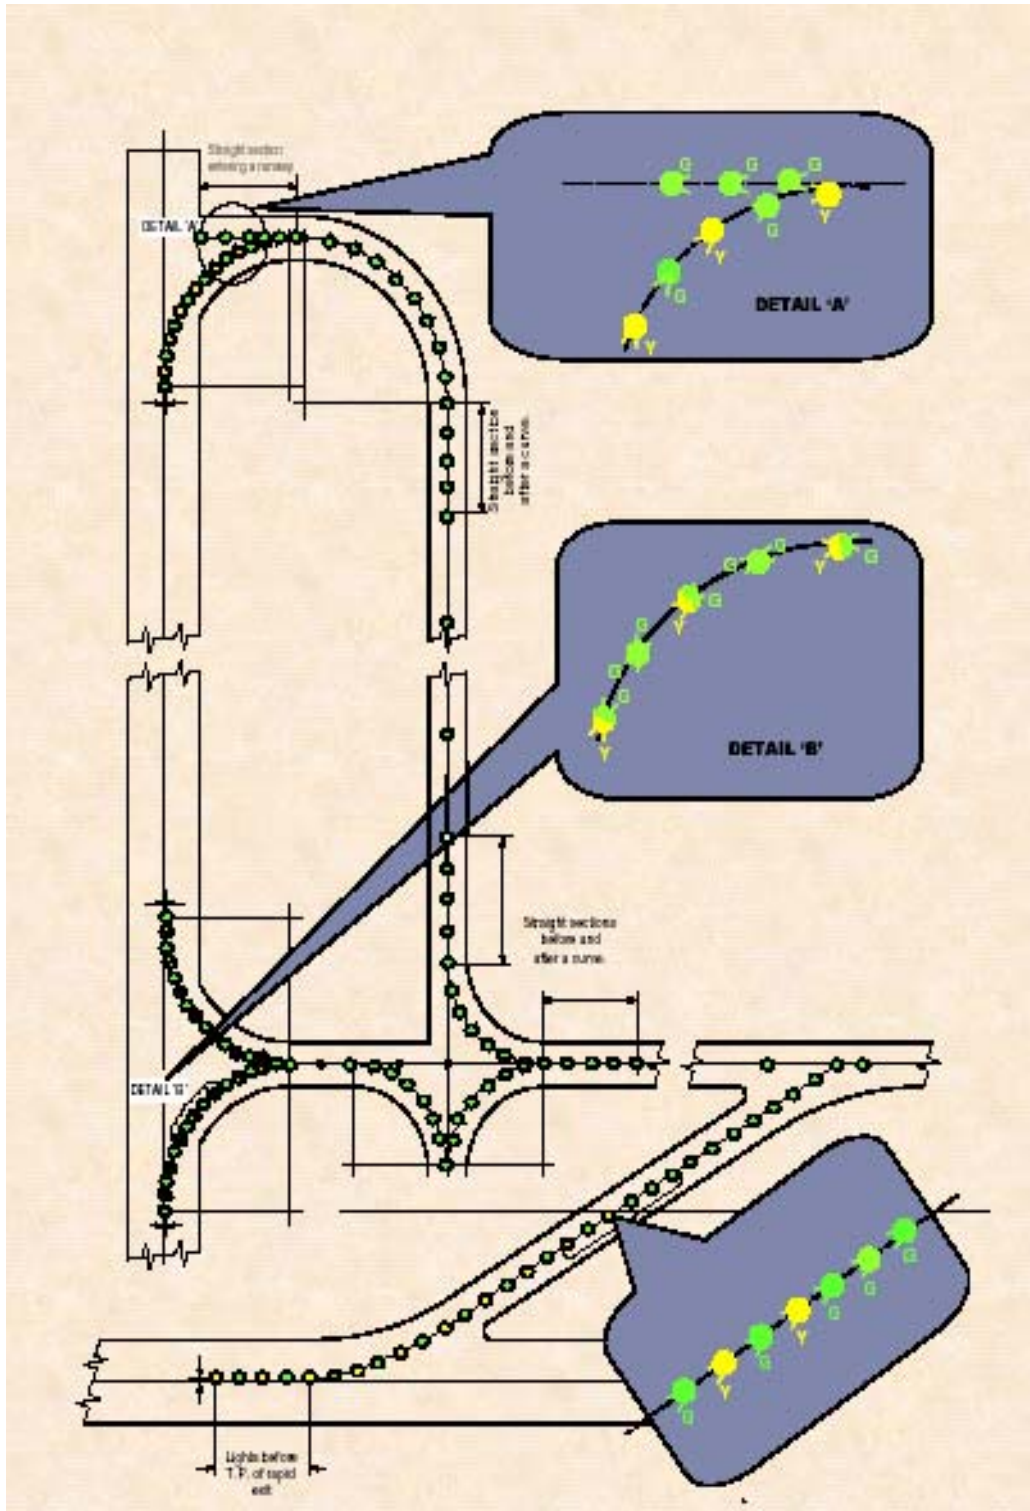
Typical Taxiway Centreline Lights Layout
